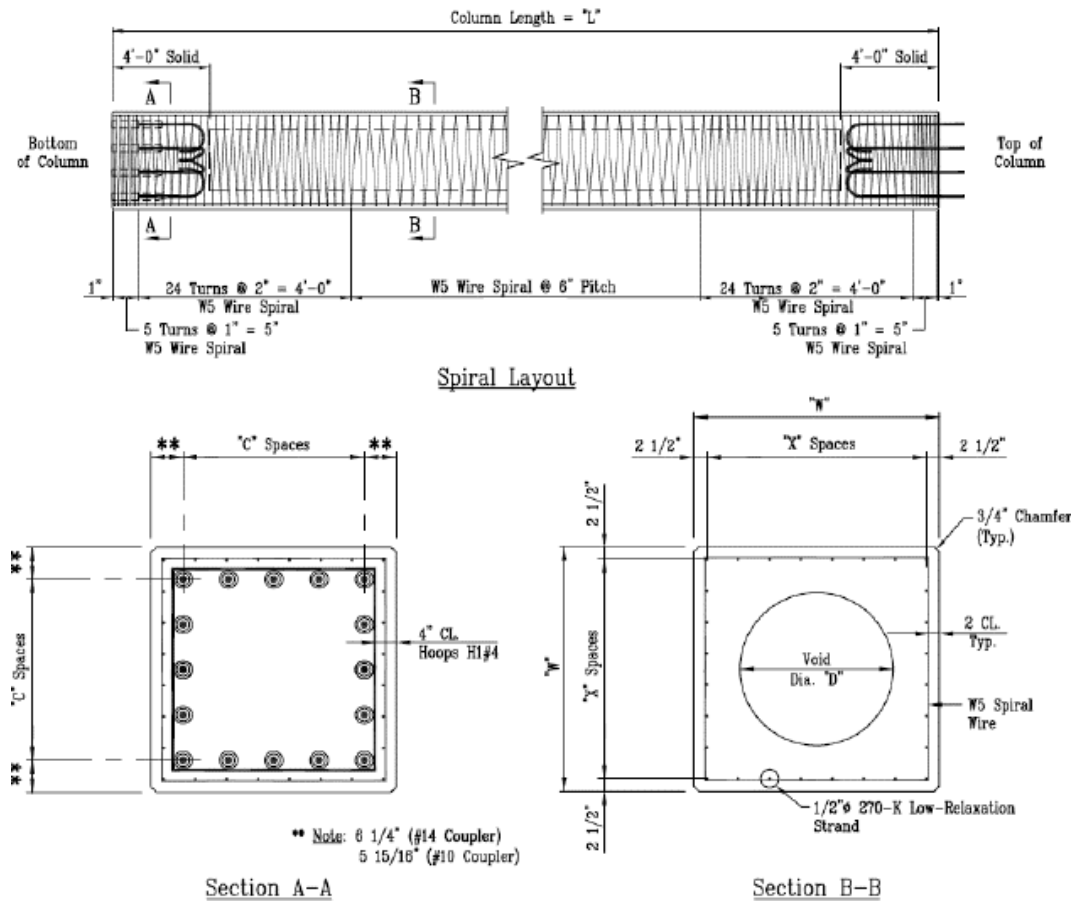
Precast column design proposed by Fouad et al. (2006)
